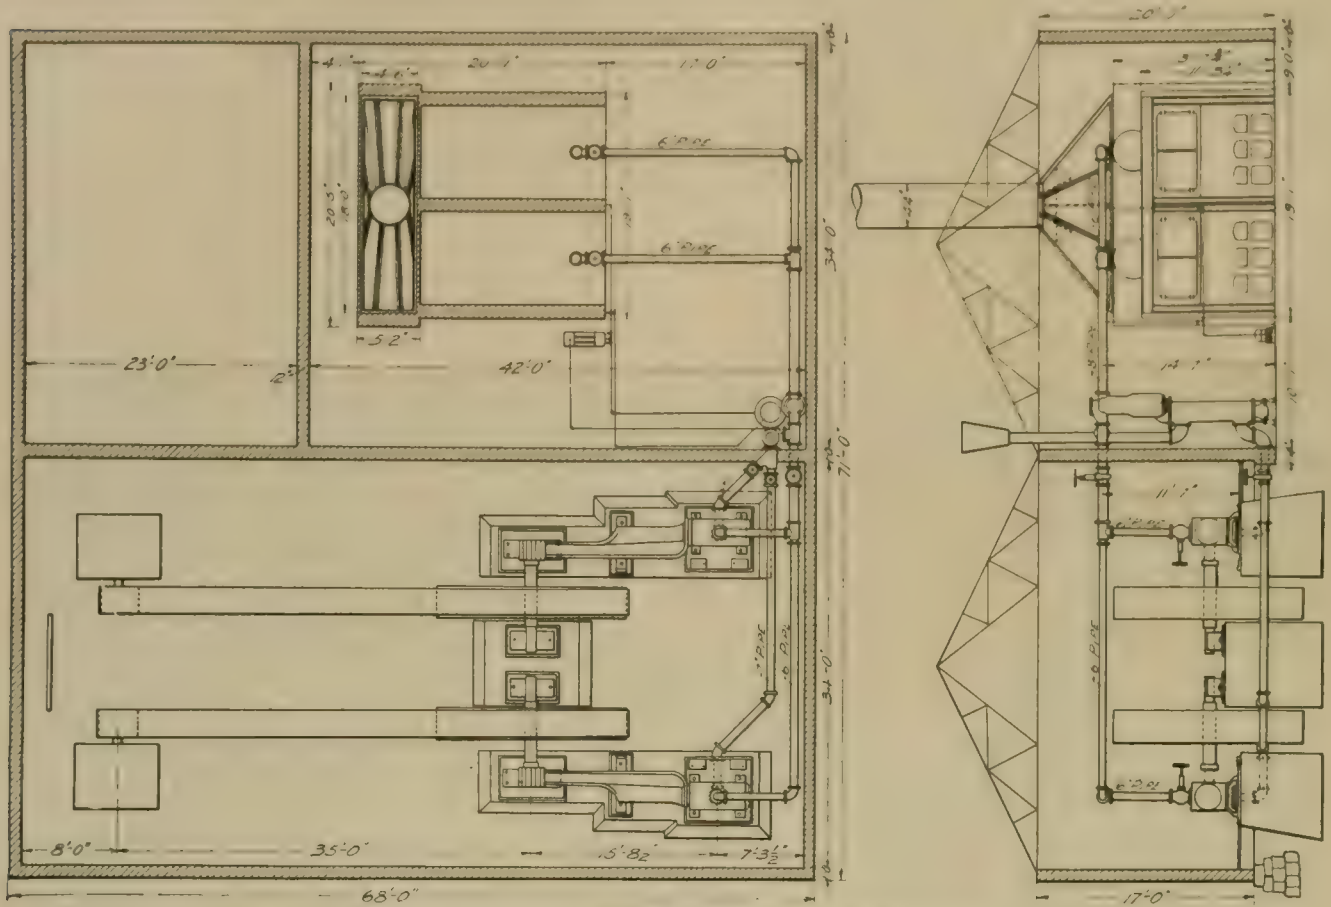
PLAN AND TRANSVERSE SECTION OF CERES STATION.
